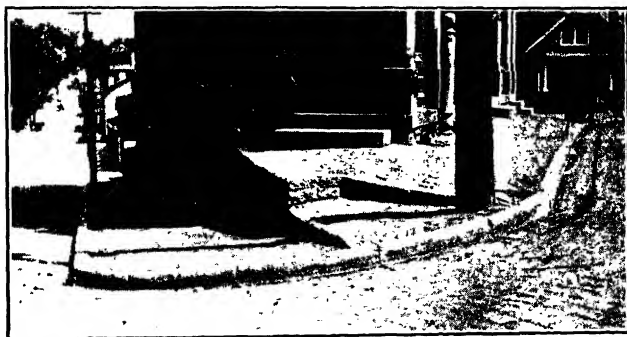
TURNING A DIFFICULT SIDEWALK CORNER.
